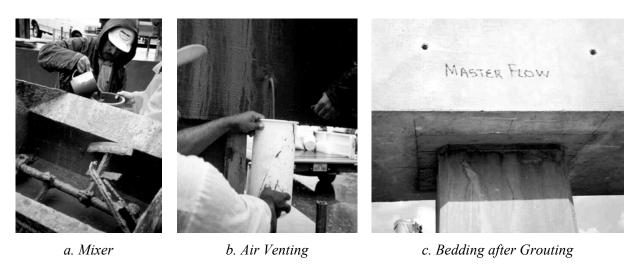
Tremie-tube Grouting of Single Line Grout Pocket (Embedded)
